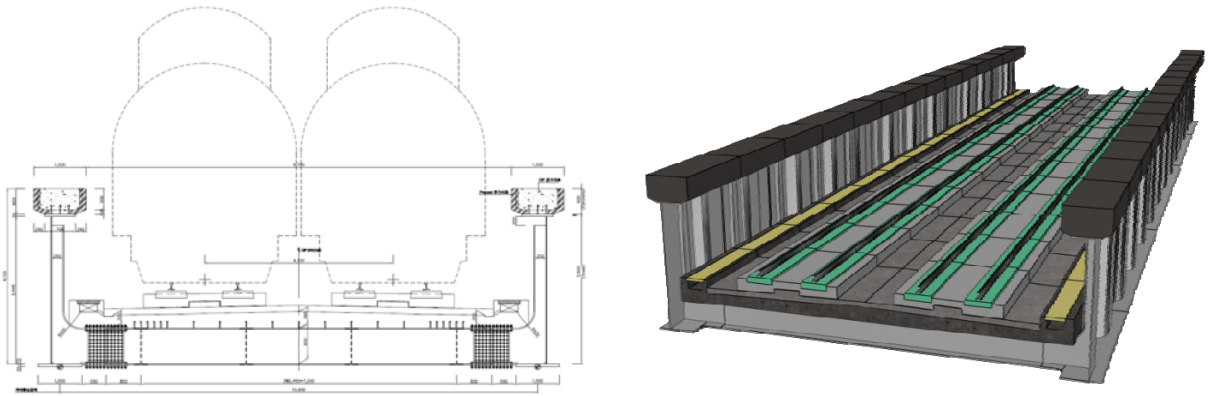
The shape of corrugated steel plate composite lower route railway bridges
